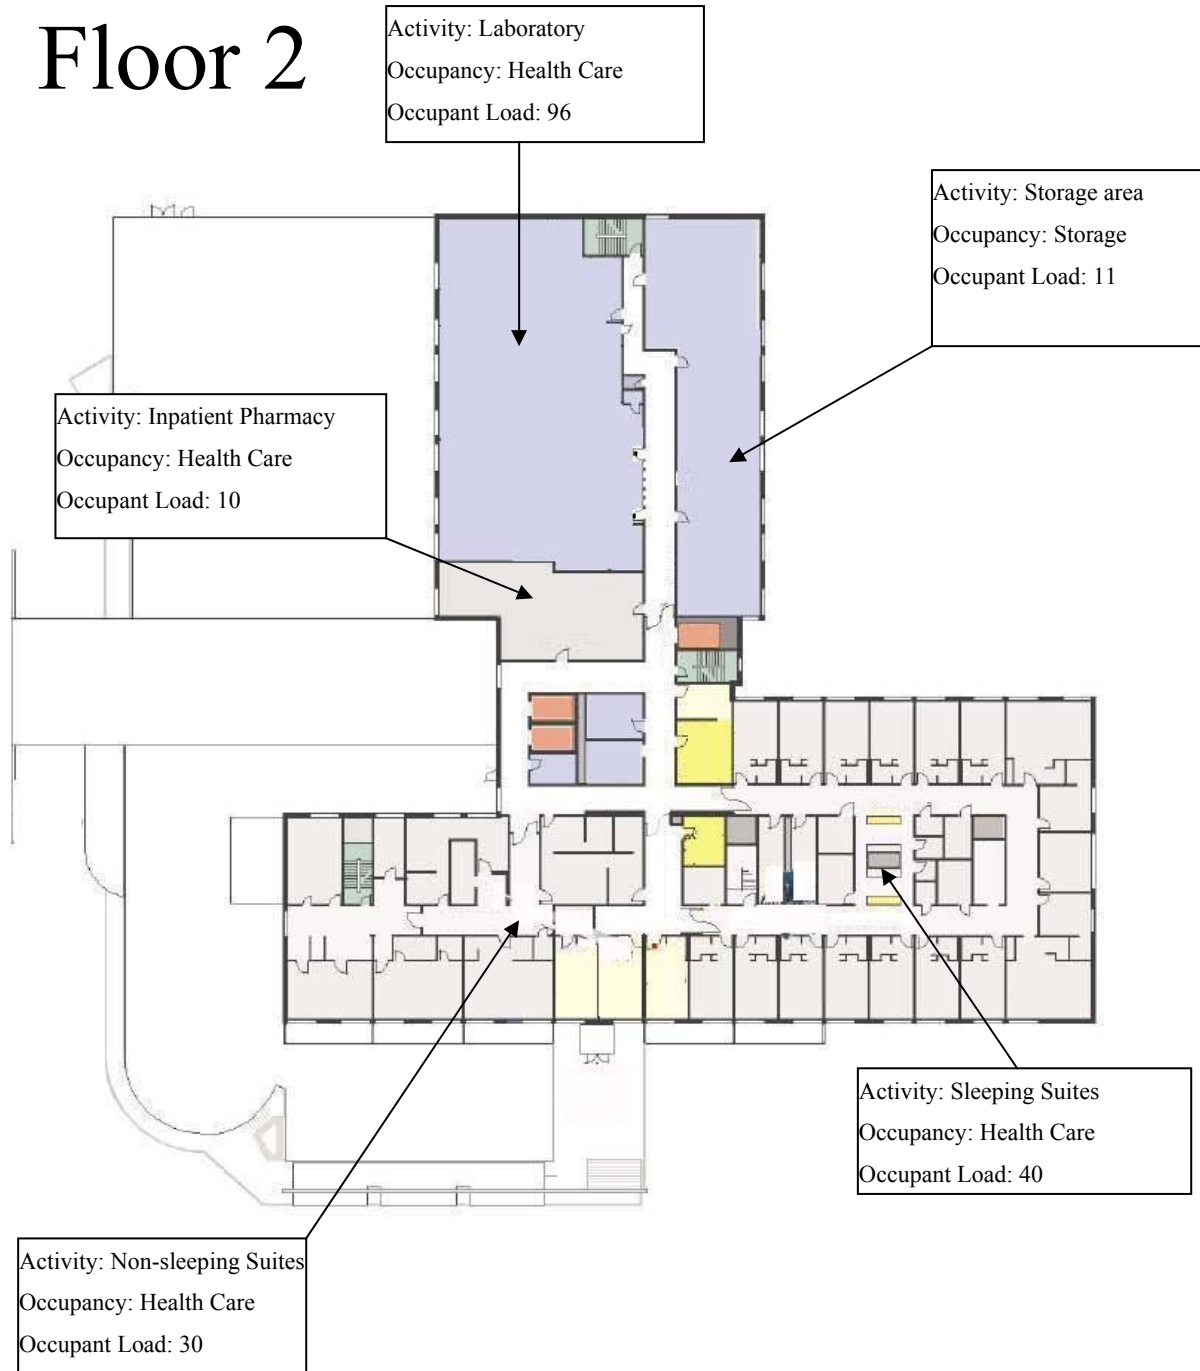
Activity, occupancy type and occupant load on floor 2
